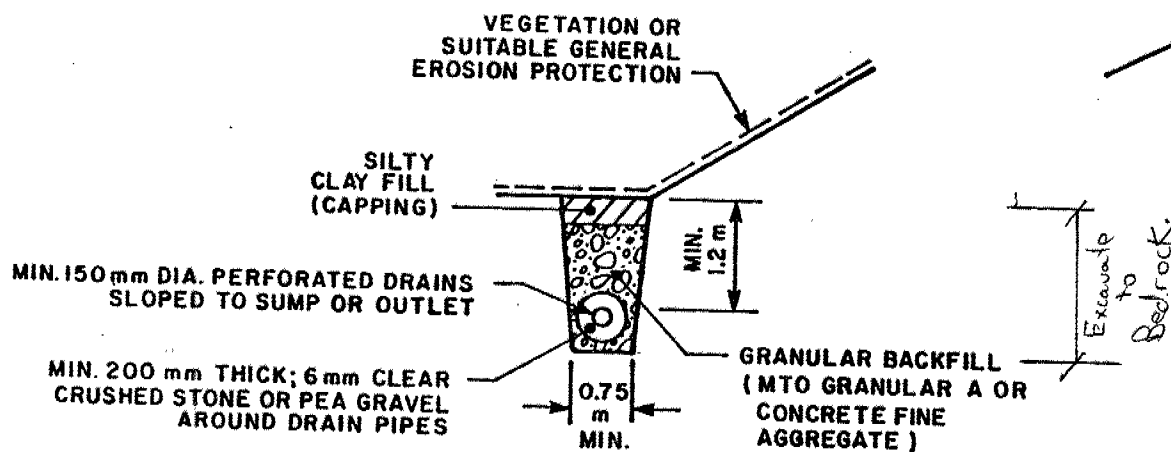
DETENTION POND DRAINAGE/SLOPE PROTECTION SCHEME
